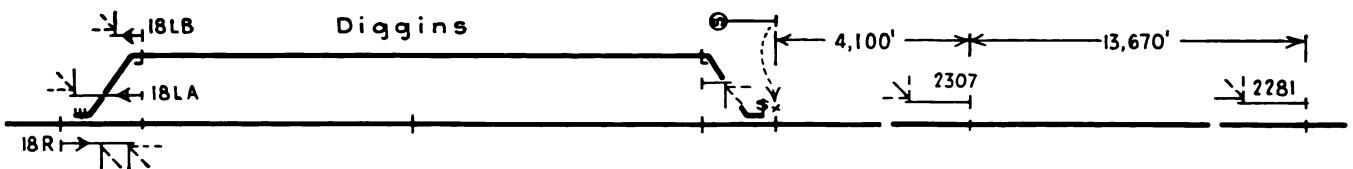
Track and signal plan for layout at the siding at Diggins
